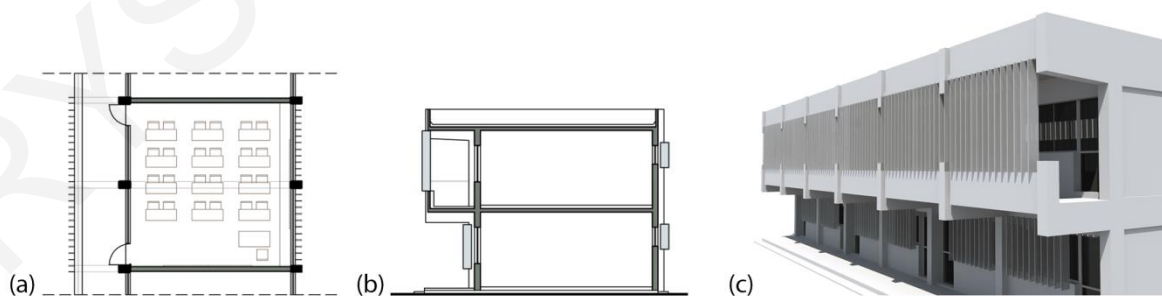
(a) First floor plan and (b) section of a typical classroom with the application of the vertical stable louvers for the reduction of glare issues in east- and west-oriented classrooms. (c) Photorealistic view of a linear disposition of classrooms with the proposed lighting and glare regulating system.
